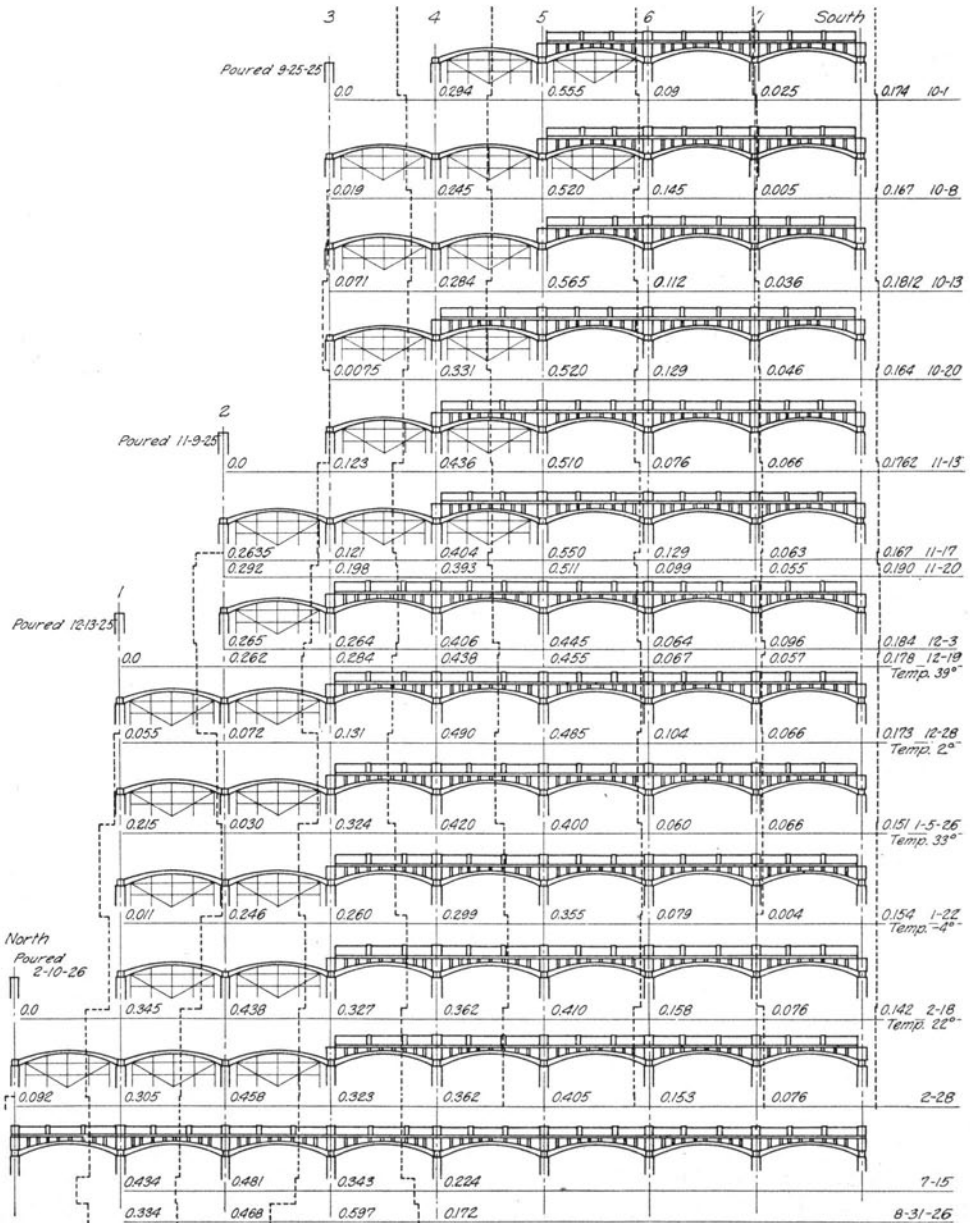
(Concluded). ROTATION OF PIERS DURING CONSTRUCTION, WASHINGTON STREET BRIDGE, ROCKTON, ILLINOIS
